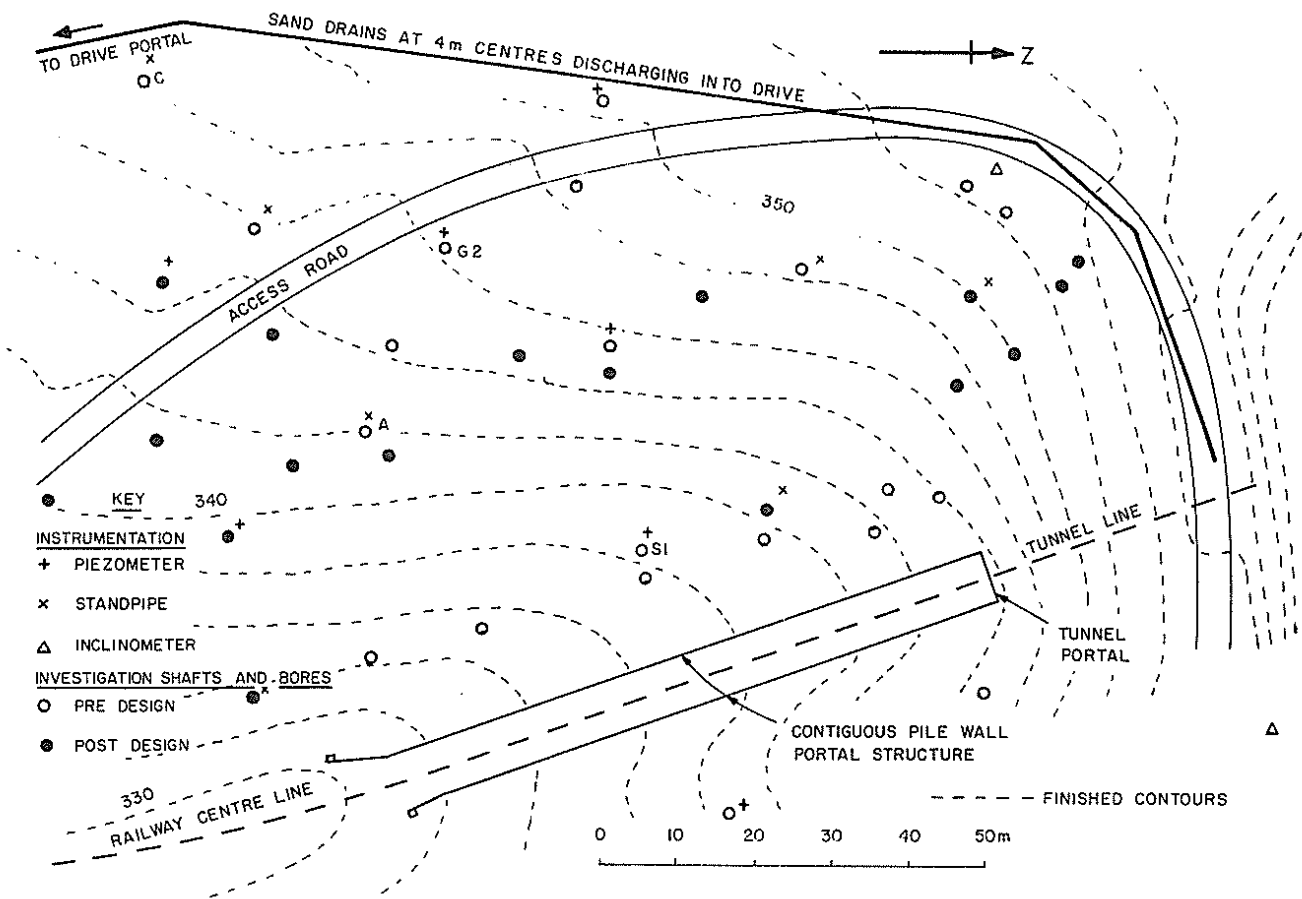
LAYOUT OF SOUTH PORTAL PORO-O-TARAO TUNNEL
